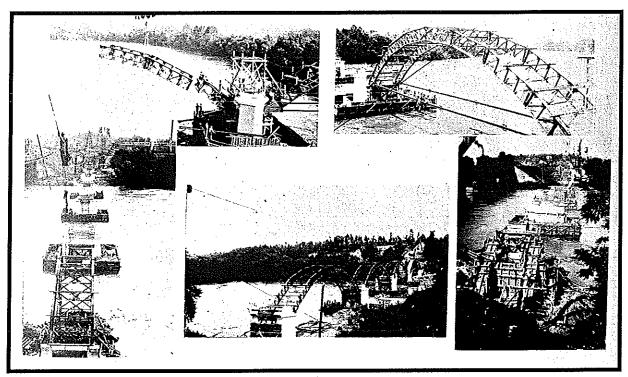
Wilcox Bridge under construction, c.1924; note steel framework to be integrated into reinforced-concrete arches (courtesy NC State Archives).
